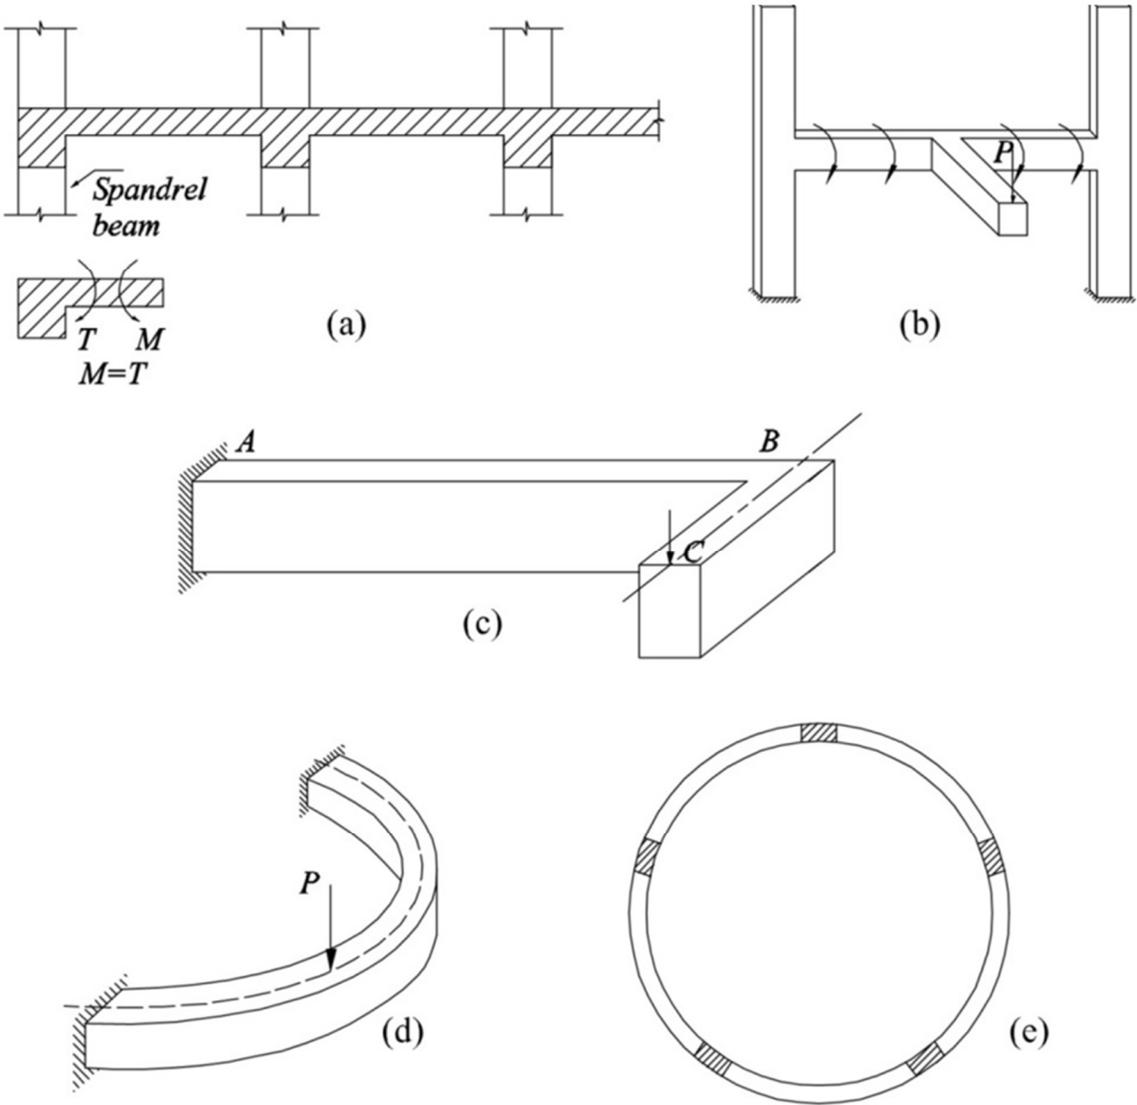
Beams subject to torsion: (a) spandrel beam (b)&(c) loads act away from the vertical plane of bending; (d) curved beam; (e) circular beam.
